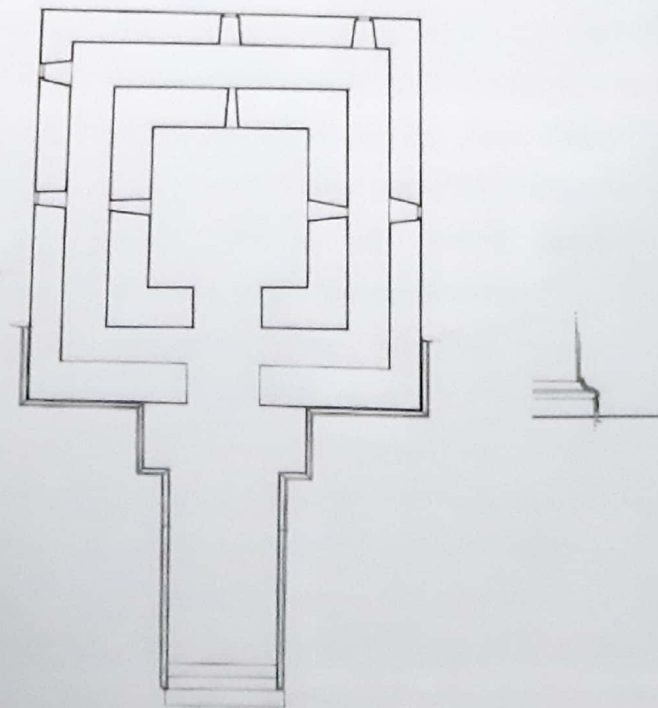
The Great Shrine. Plan with detail of the podium's moulding. For dimensions and scale, see *Dimensions* above, and Pls III-IV (Drawings by FM).
